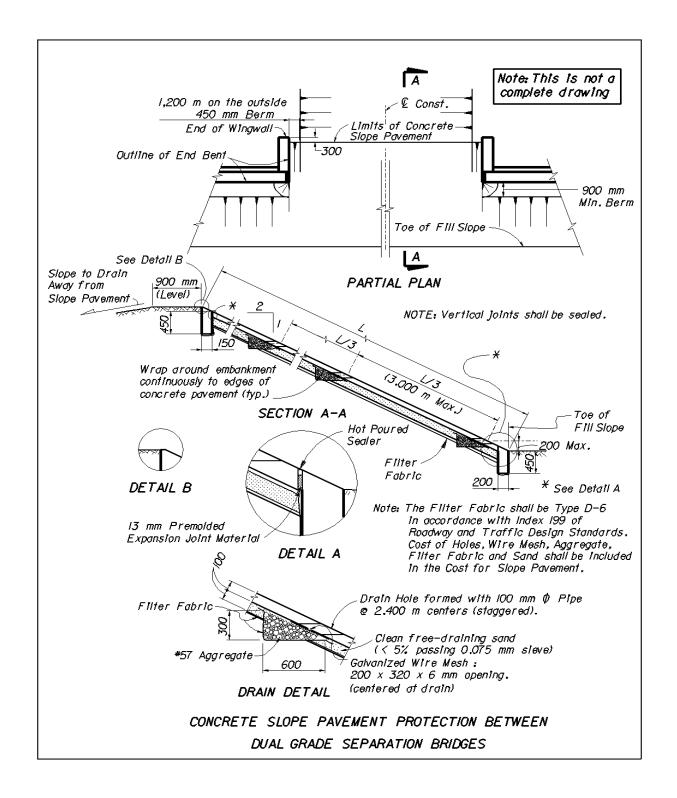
Concrete Slope Pavement Protection Between Dual Bridges
